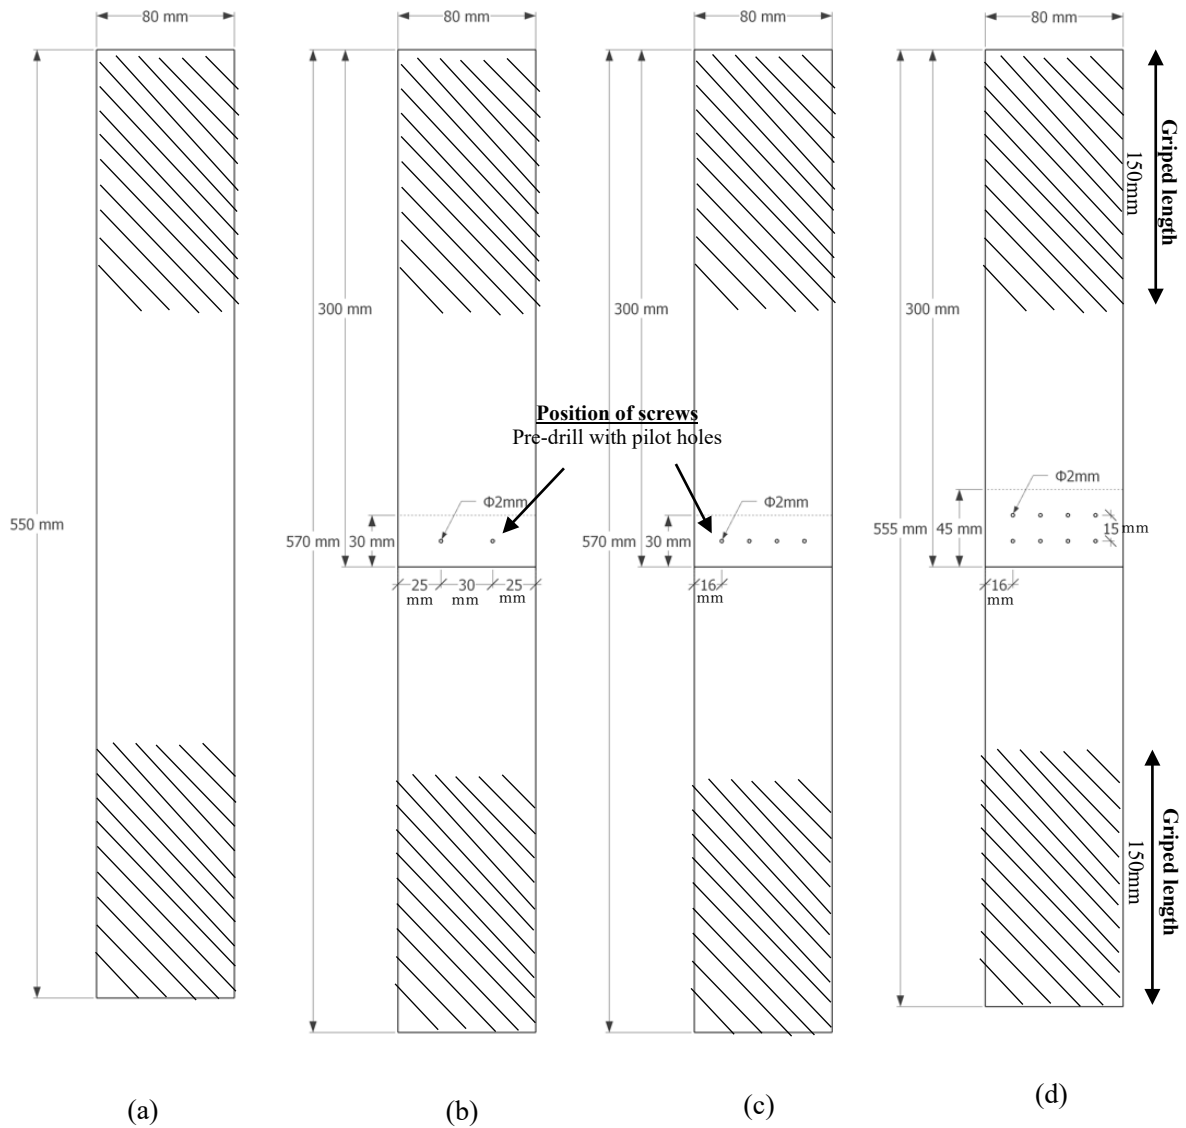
Details of steel sheet specimens and screwed connection specimens
